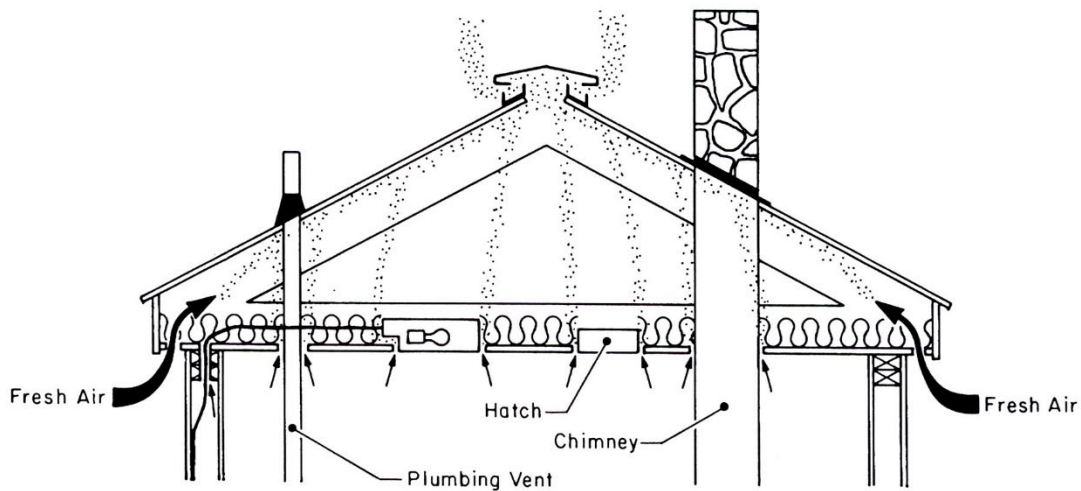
Typical Low Sloped Roof with Attic Ventilation
